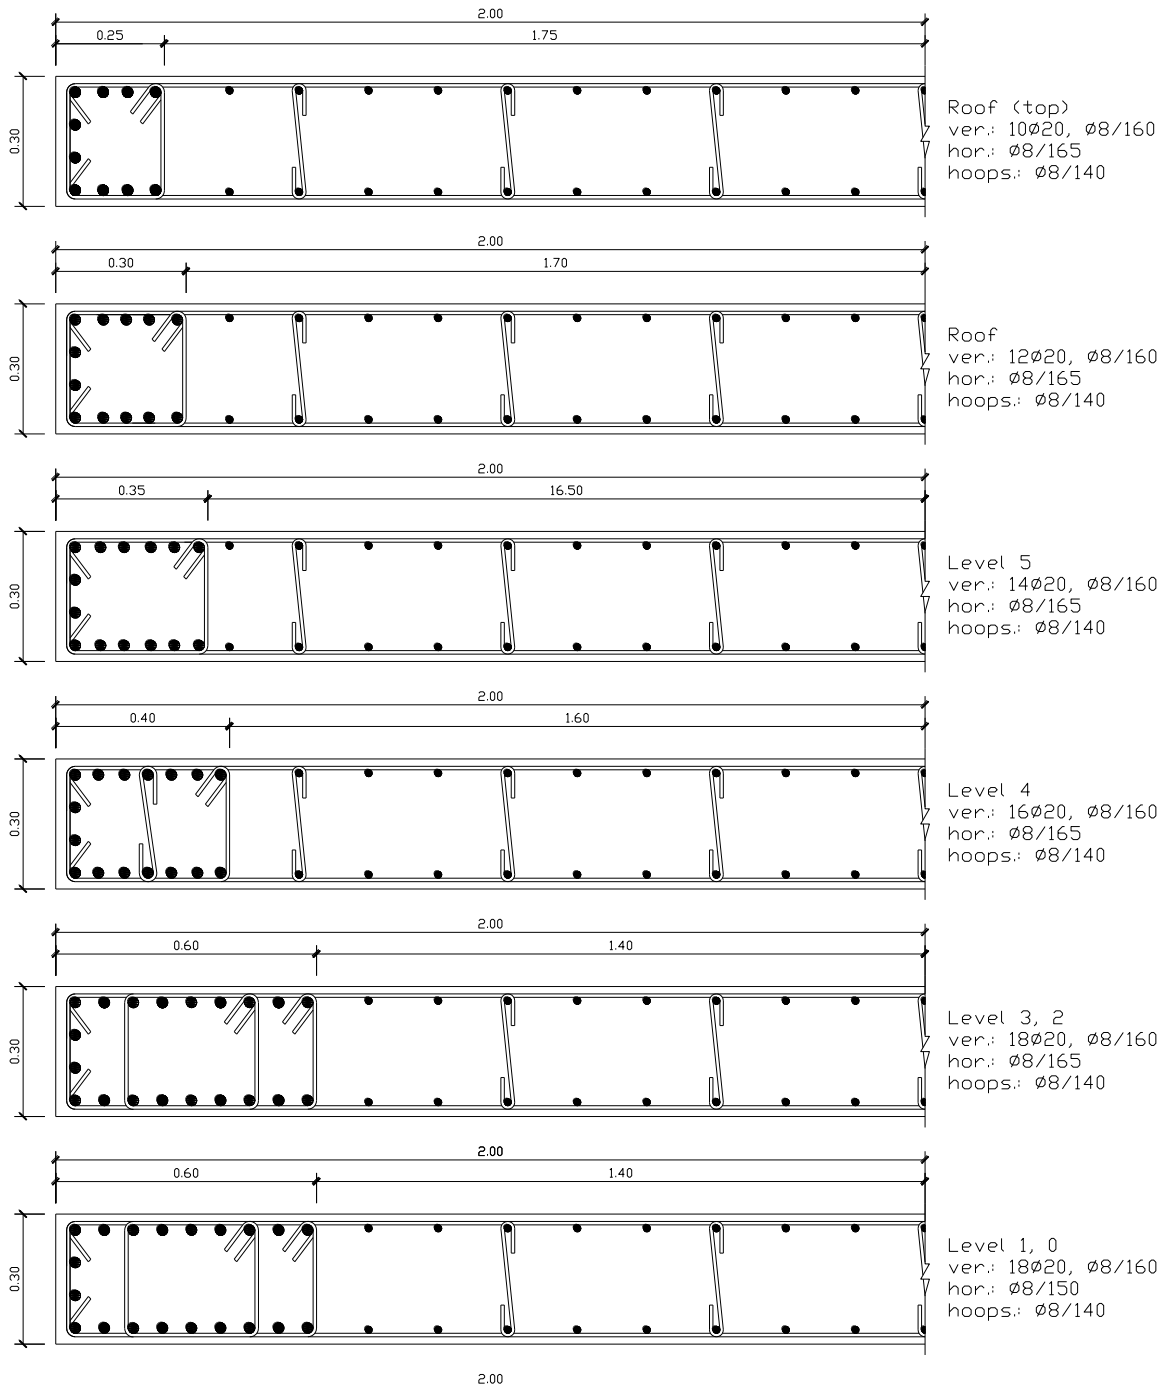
Longitudinal reinforcement of wall W1
